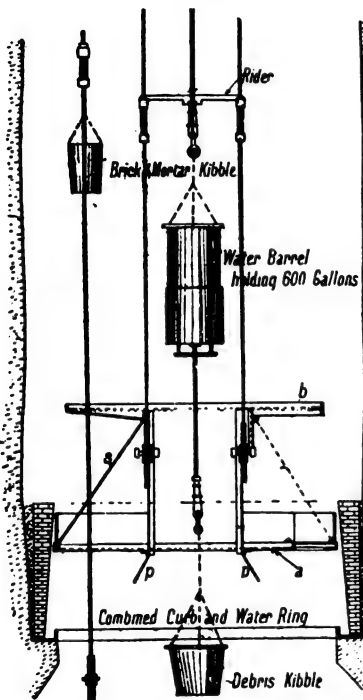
Section of scaffold used at Newcastle Colliery.
